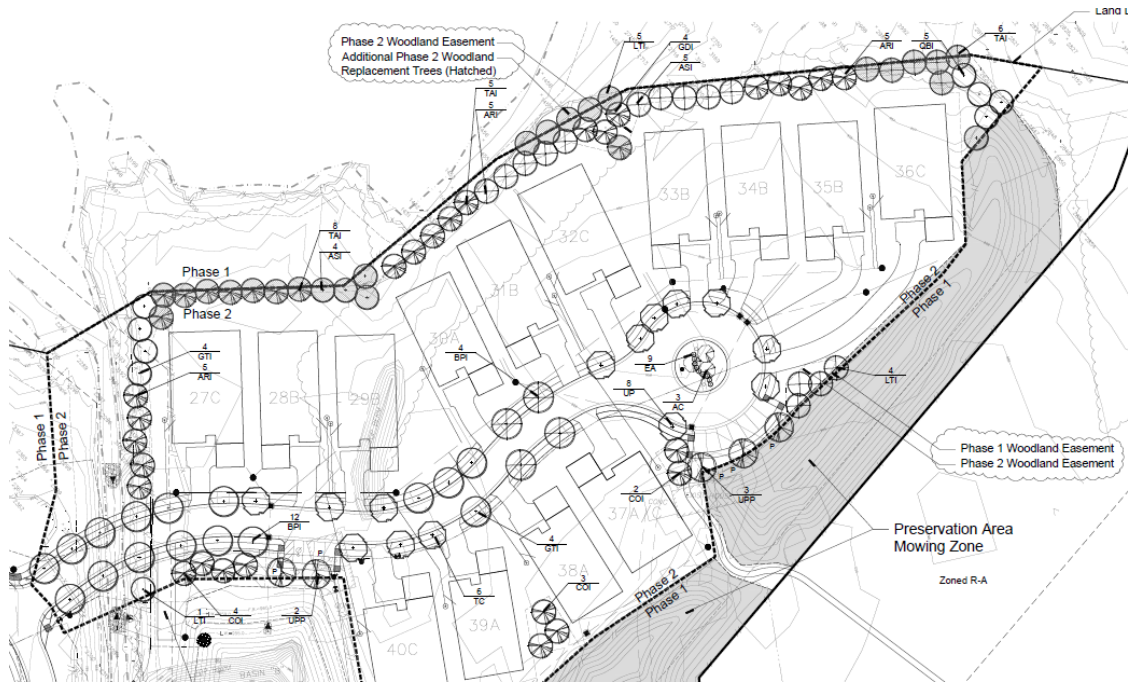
Phase 2 Landscape Plan, June 1, 2021
